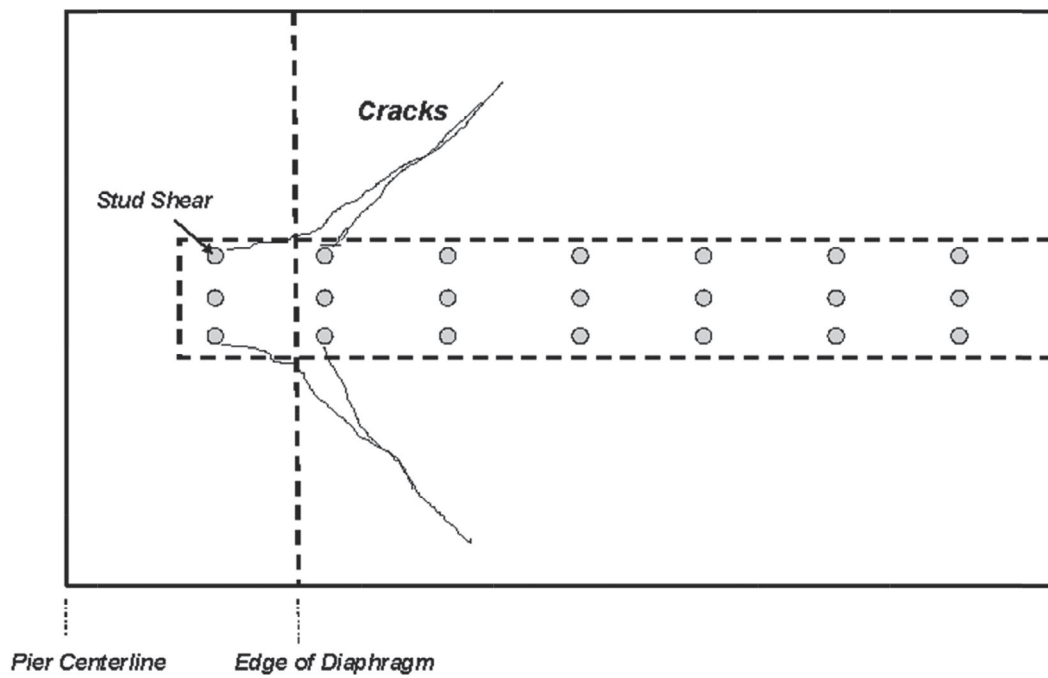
Concrete failure of the specimen 2 deck.
